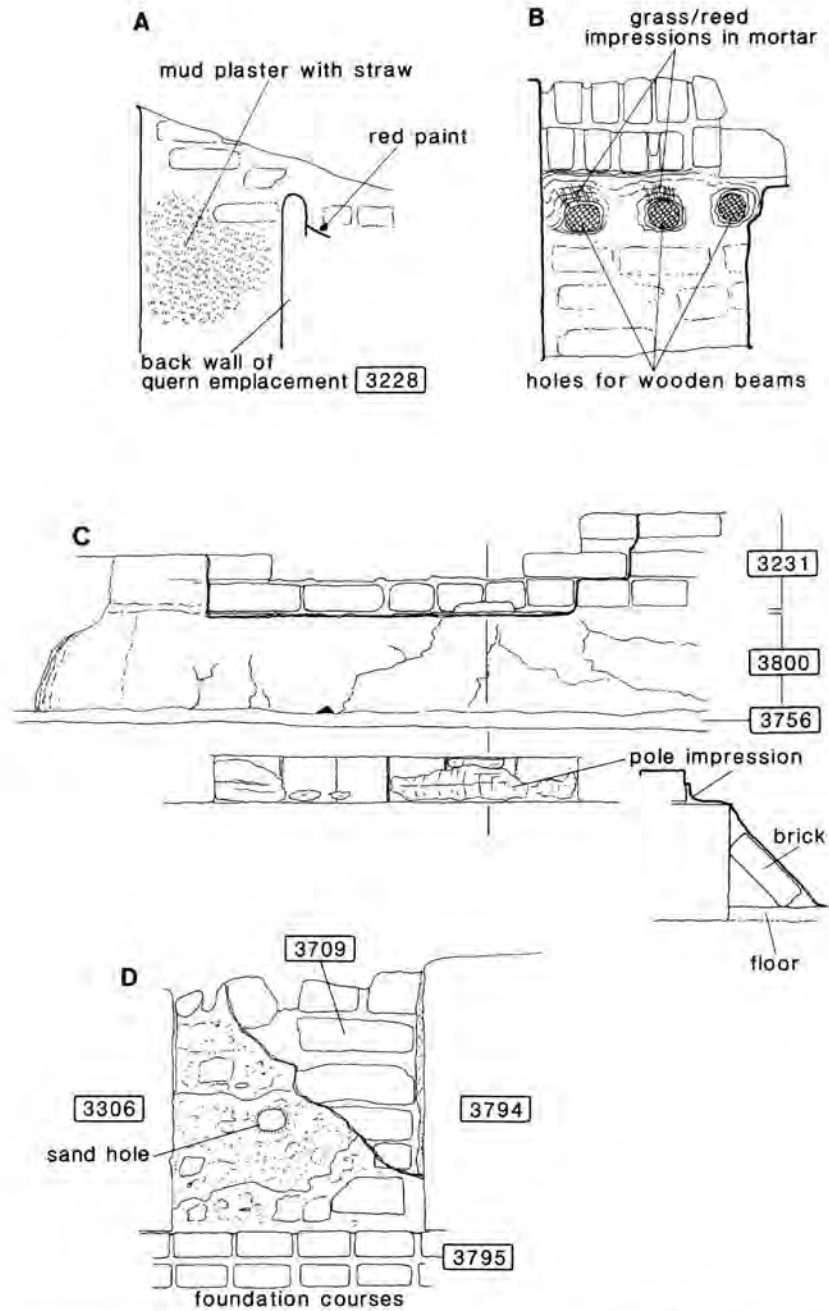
Sketches of constructional details: (A) the dividing wall between areas 13 and 14 (to north); (B) holes for wooden beams to support the staircase (to south); (C) sloping wall-footing in area 15; (D) blocked door between areas 4 and 7.
